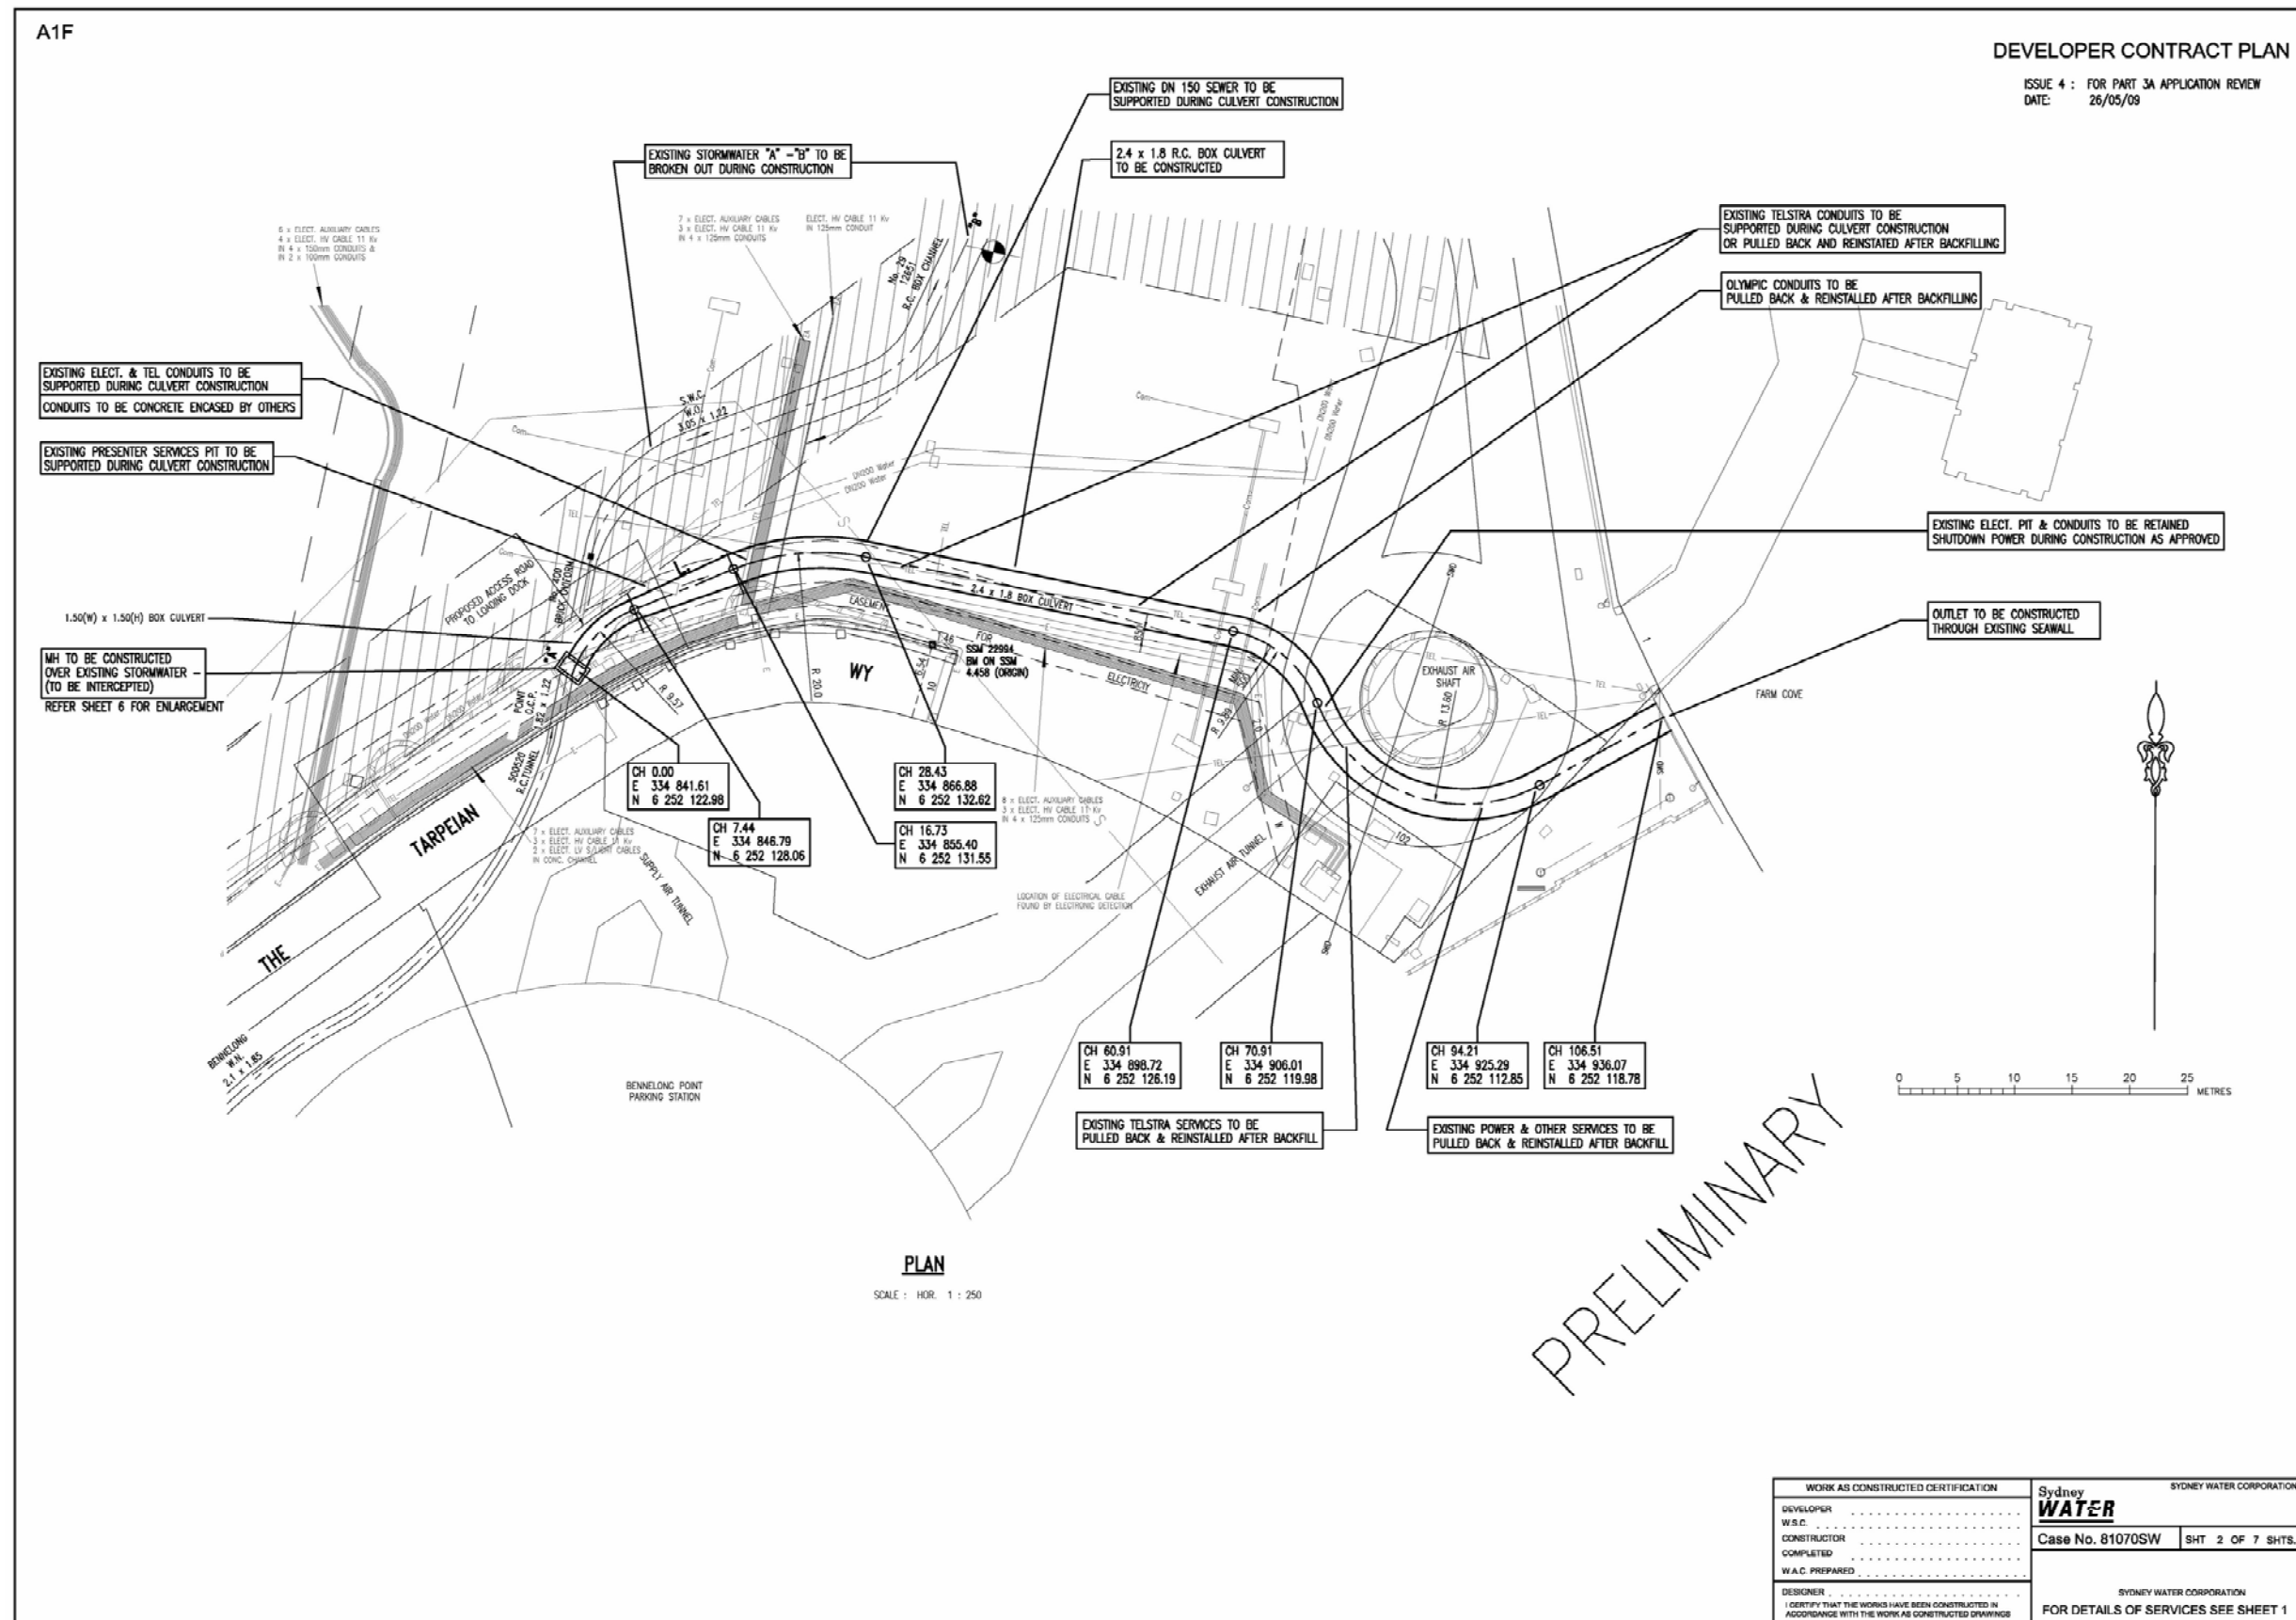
Plan of the Sydney Opera House forecourt showing details of proposed works. The study area of this report is outlined. This plan also indicates the location of underground services across this area. (The 'proposed access road to loading dock' also shown on this plan is not the subject of this report.)
